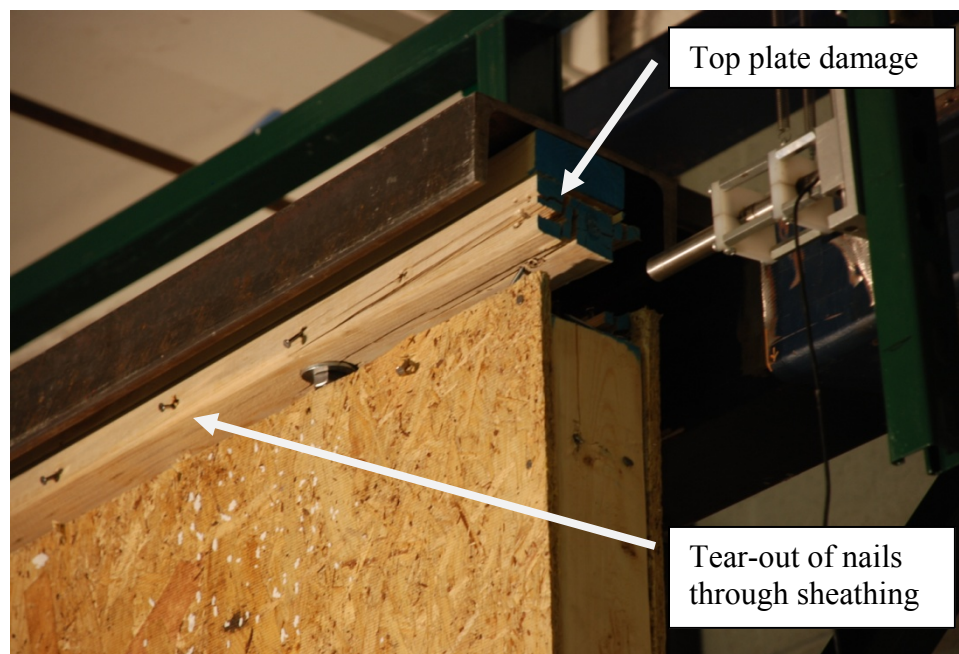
Deflection of top plate from sheathing and end posts caused by sheathing failure and splitting of top plate along nail line connecting top plate to end posts in Specimen B-1C after Fatigue 1
